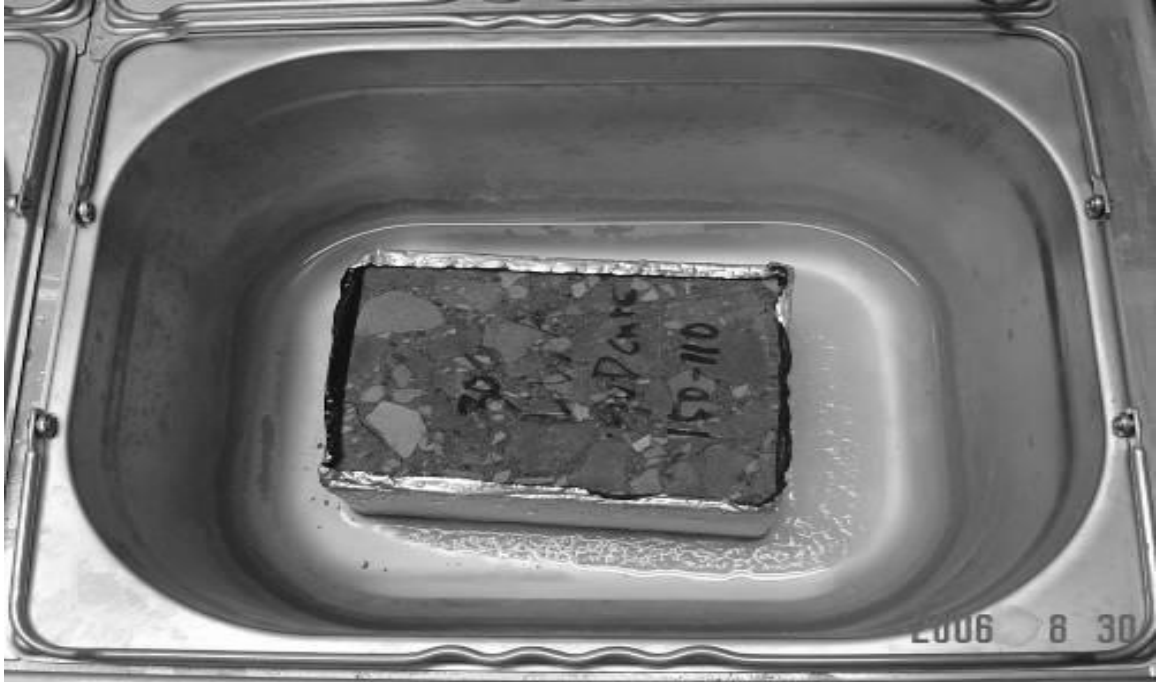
Specimen with Test Surface Facing the Bottom under Frozen Condition
